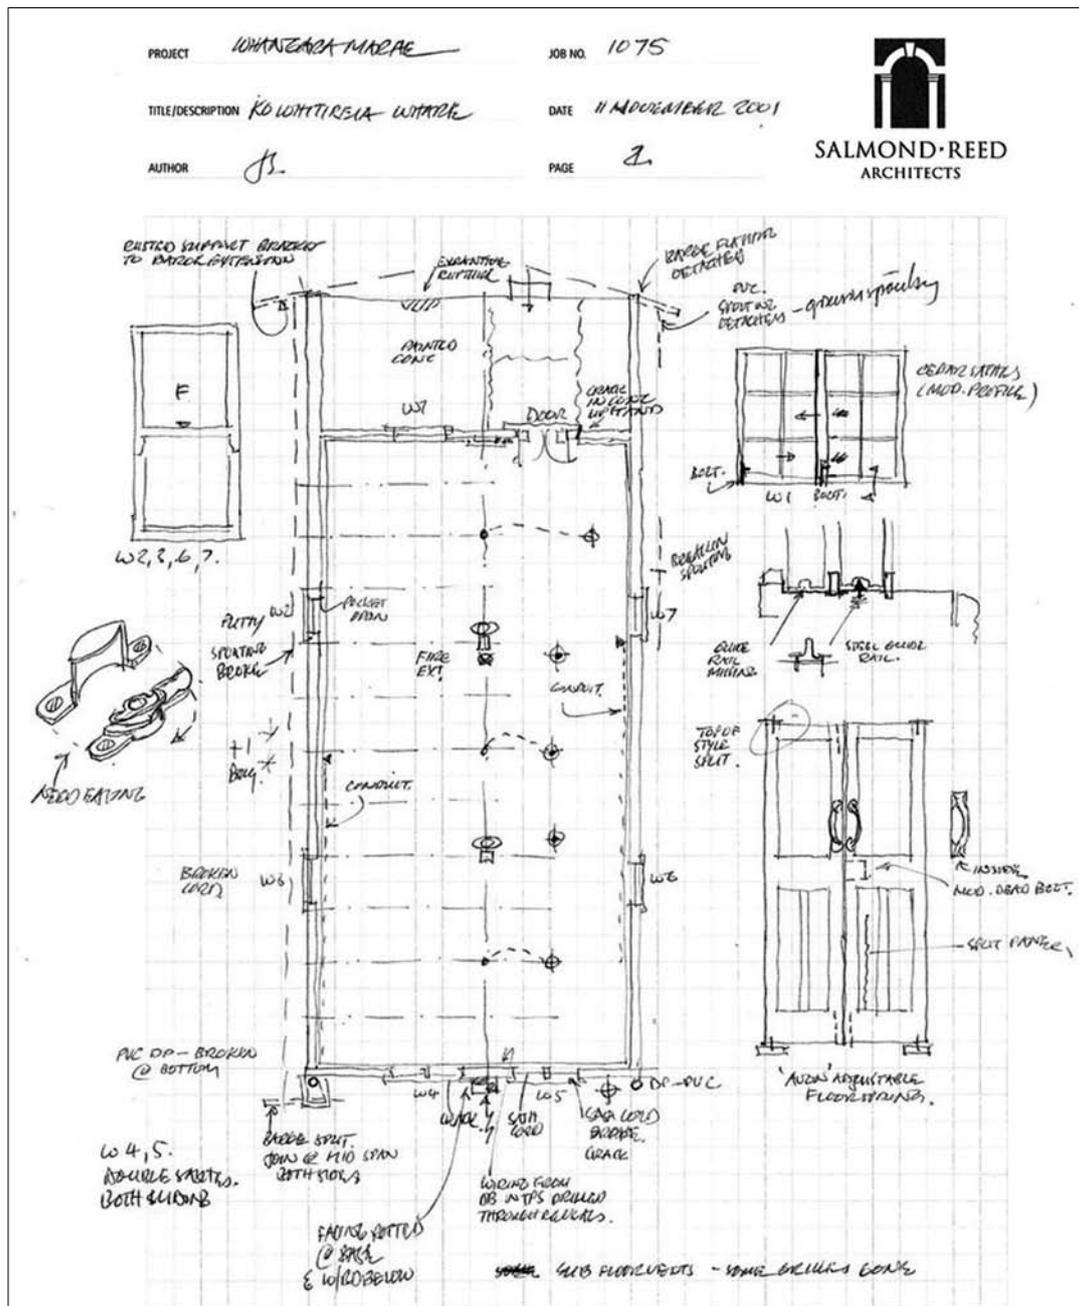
Site sketch plan for church at Whangara, near Gisborne, showing showing some construction details and recording the condition of various features.
